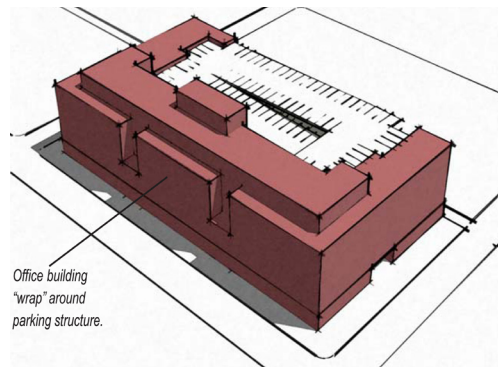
(Source: Rendered by Adam Krom, Wallace, Roberts and Todd, Plan for Peoria, Illinois)
